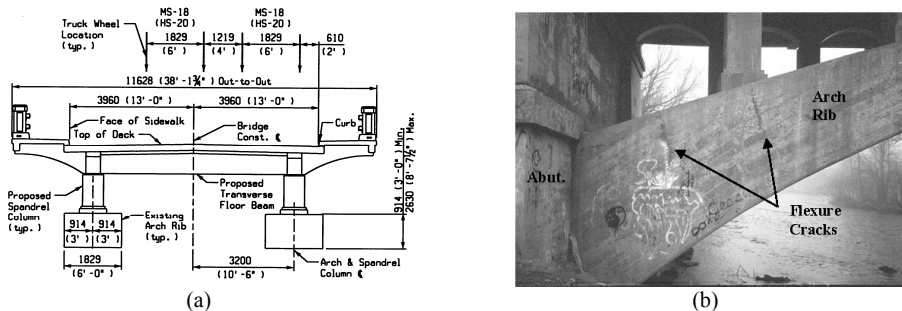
(a) Typical bridge section showing truck placement; (b) Photograph of typical existing cracks in the arch ribs.
